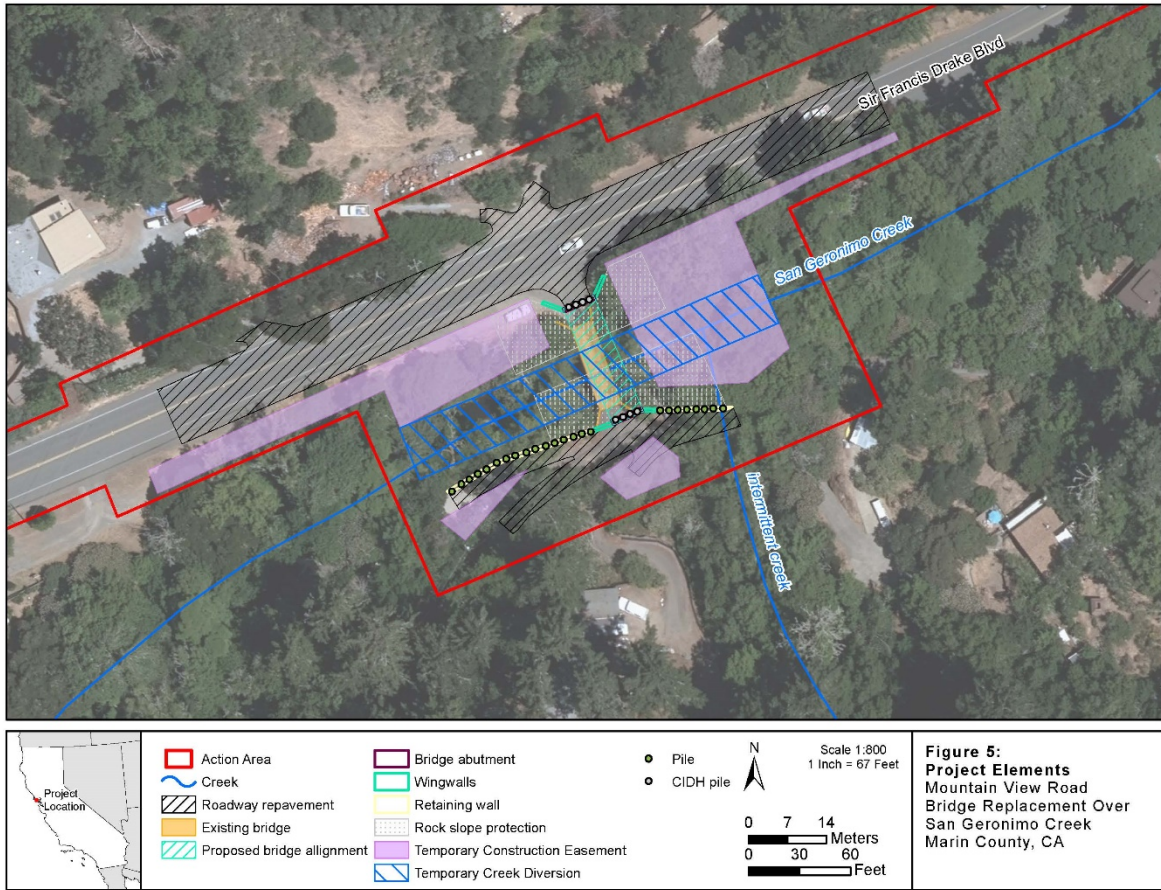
Action area and Project Elements for the Mountain View Road Bridge Replacement Project.
